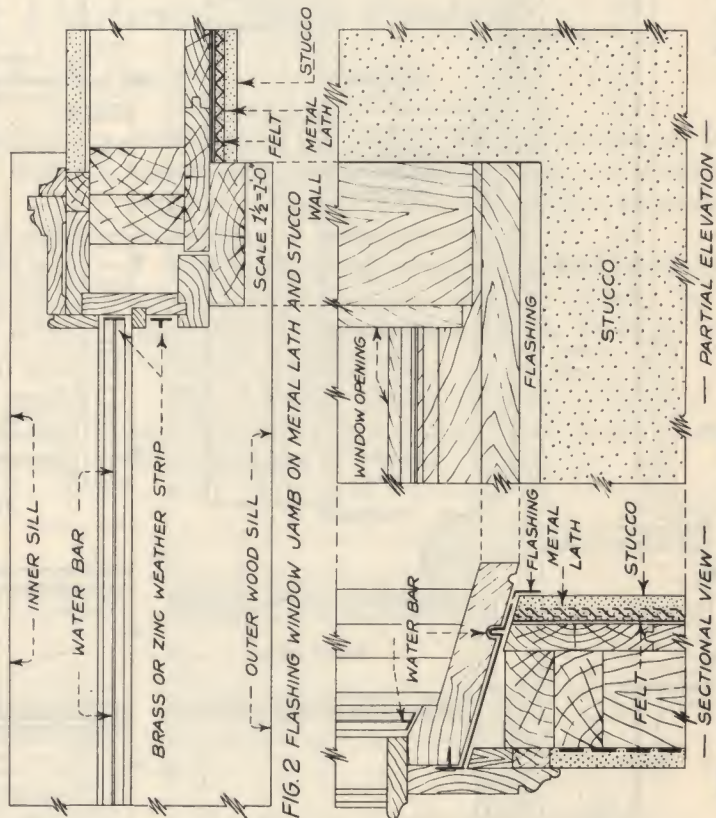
FLASHING WINDOW JAMB ON METAL LATH AND STUCCO WALL — SCALE $1\frac{1}{2}'' = 1'-0''$
